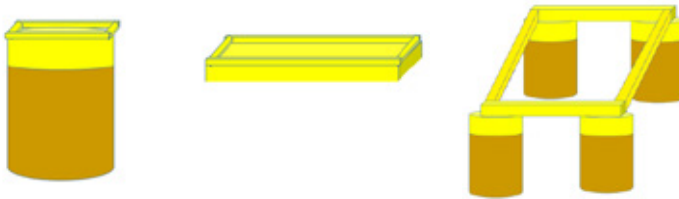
Illustration of different foundation concepts; (a) Single suction caisson foundation & (b) Mud-mat foundation and (c) 4-can foundation
